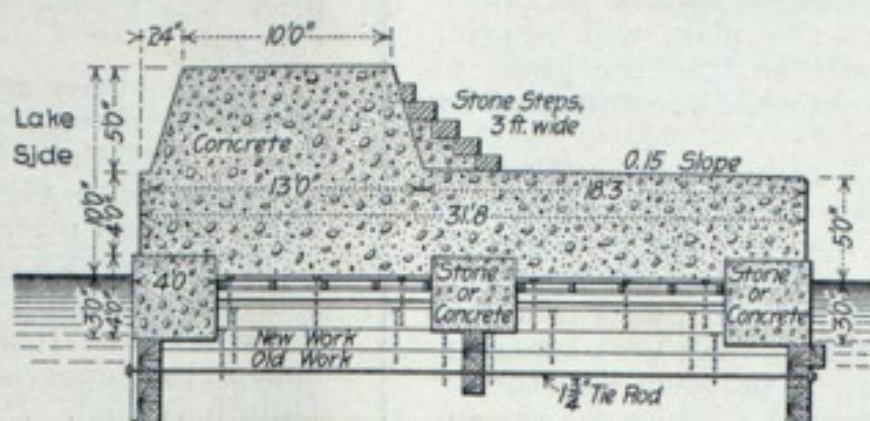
Typical cross-section of concrete superstructure for west breakwater, Cleveland harbor.
